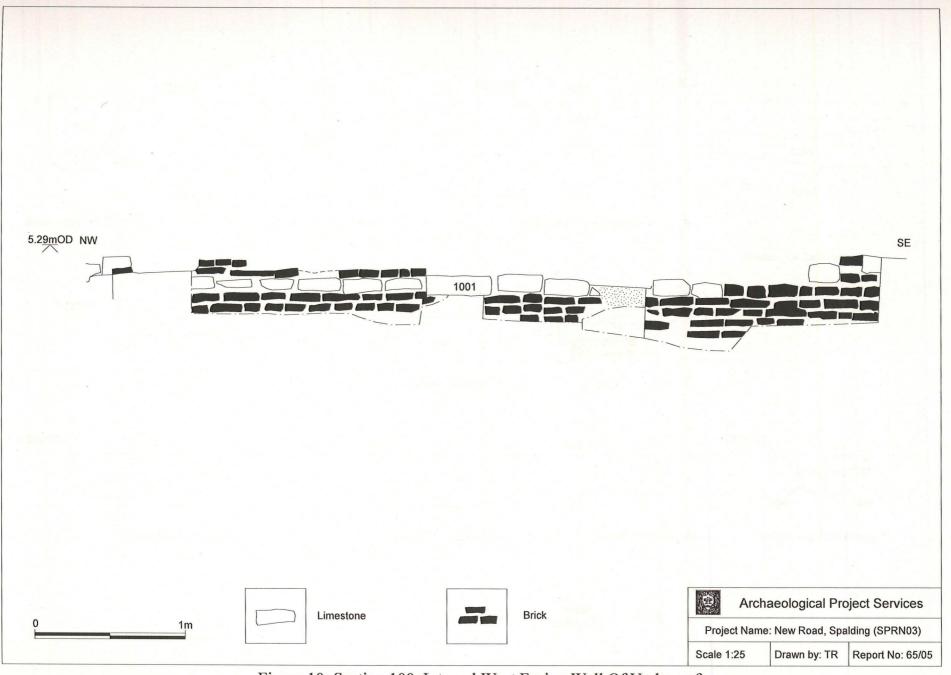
Section 100, Internal West Facing Wall Of Undercroft
